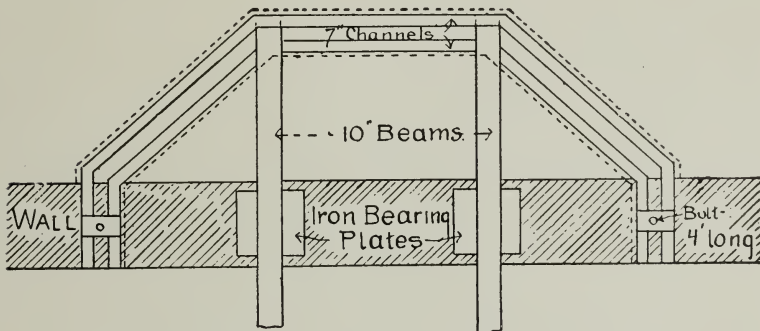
Bay-window Supports. Steel Beams and Channels.
